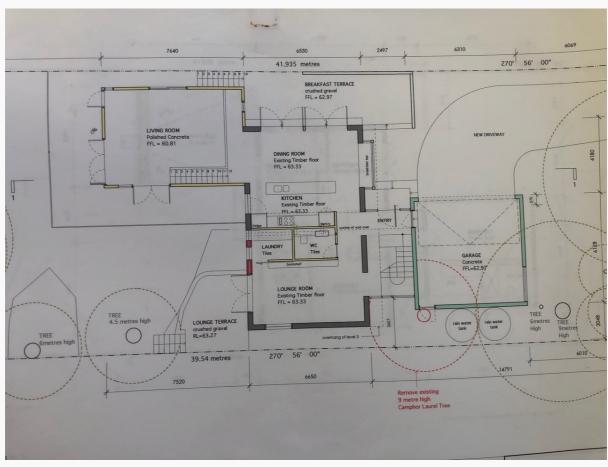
Ground Floor Plan of 39 Heathcliff Crescent, depicting the locations of primary internal living spaces.
